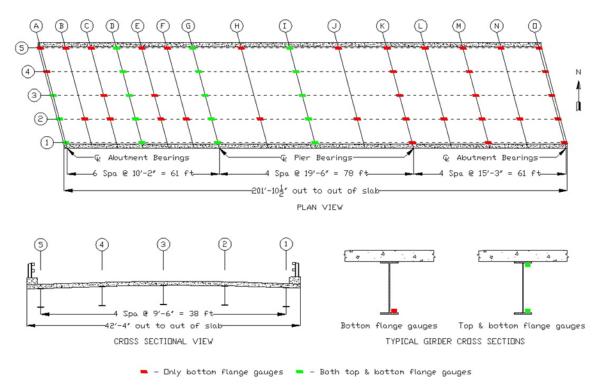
Instrumentation layout plan for girder gauges on I-80 EB Bridge over Sugar Creek
